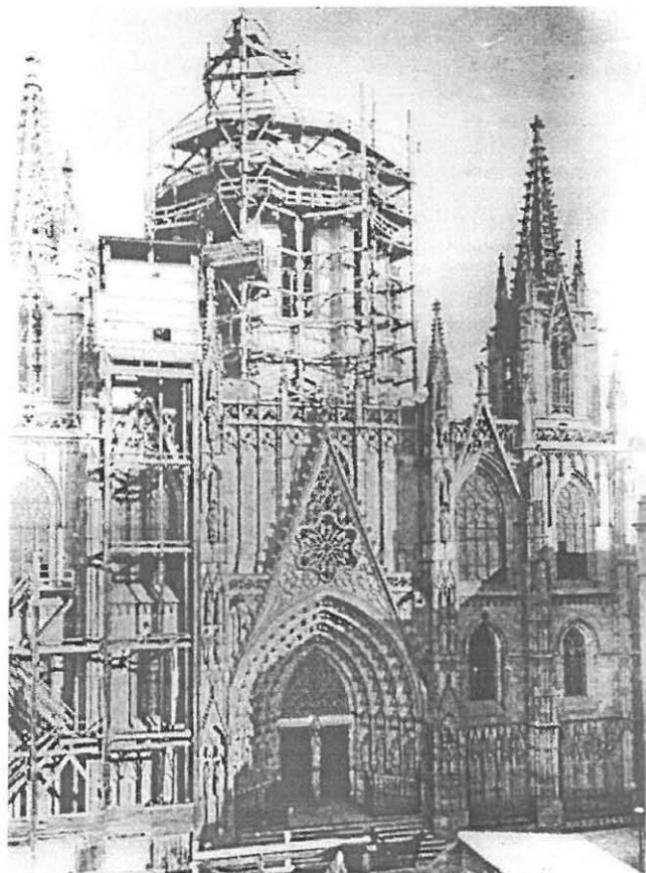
View of the façade during the construction of the new cimborio (circa 1900).
